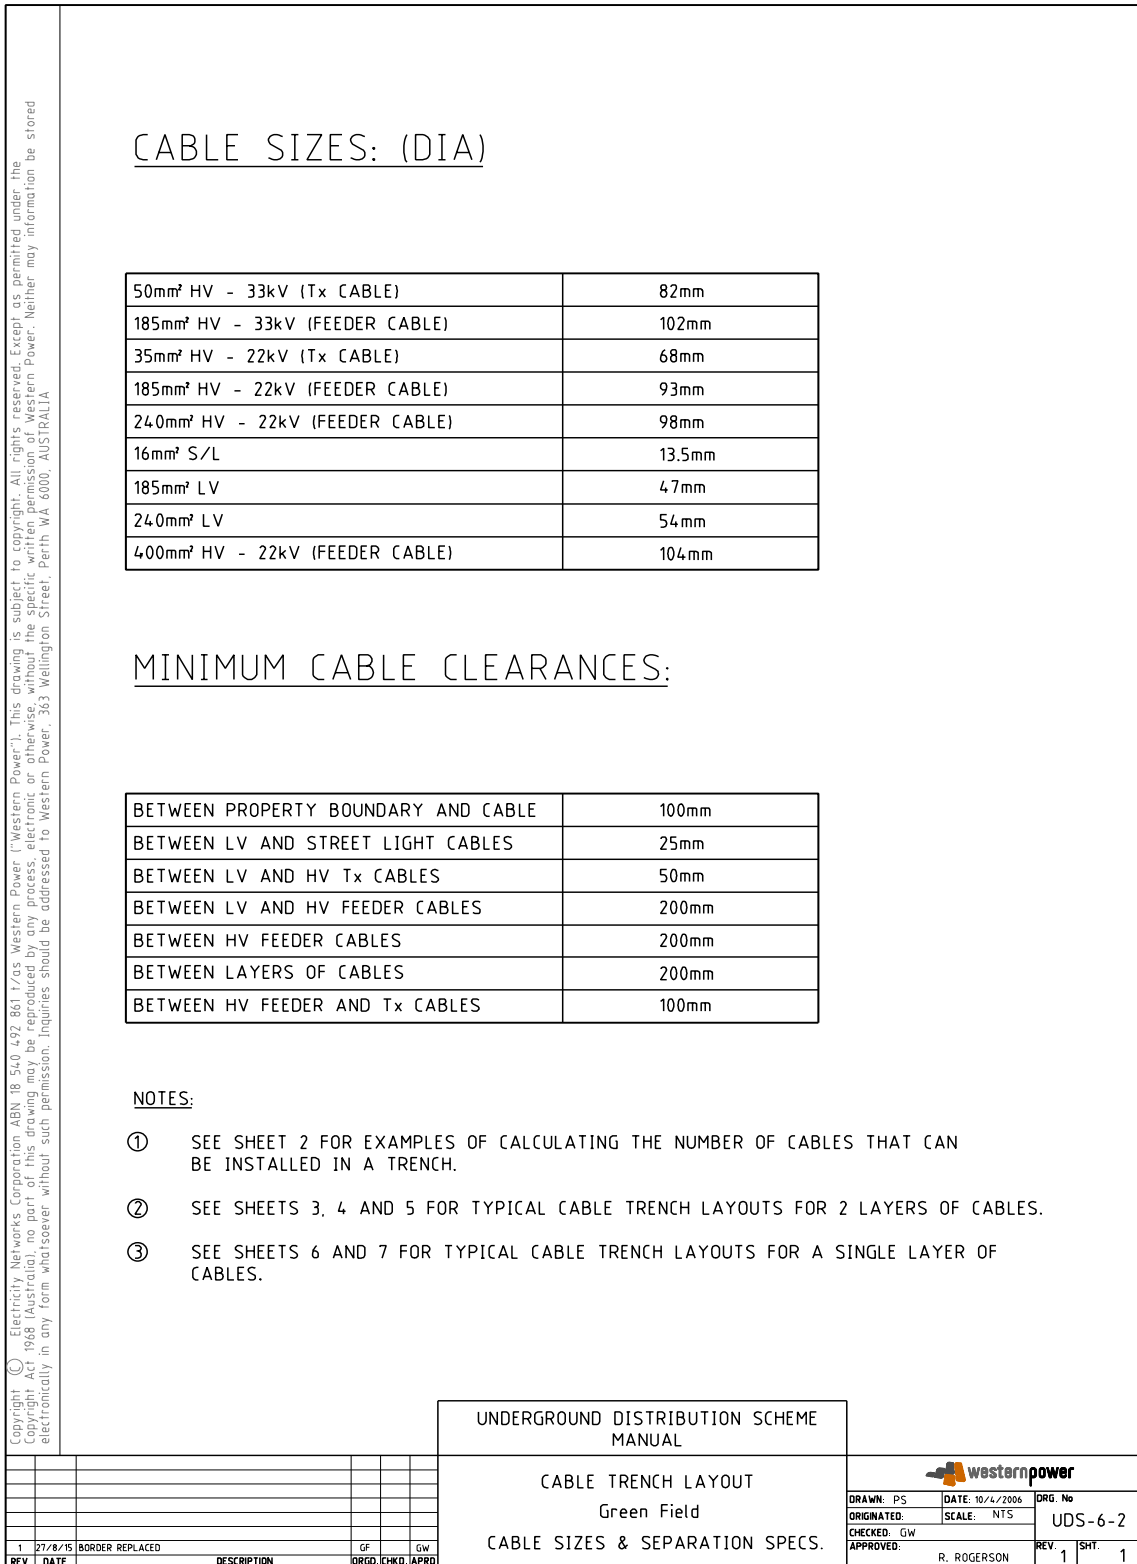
Cable Trench Layout (Sheets 1 of 7)
